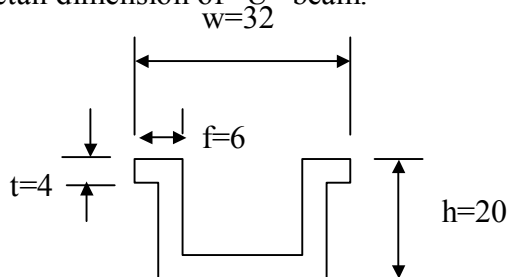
Detail dimension of “U” beam(All dimension in mm)
